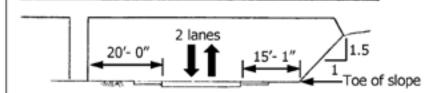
Bridge elevation view of horizontal clearances for a 2-lane highway feature with 2way traffic below the bridge.
